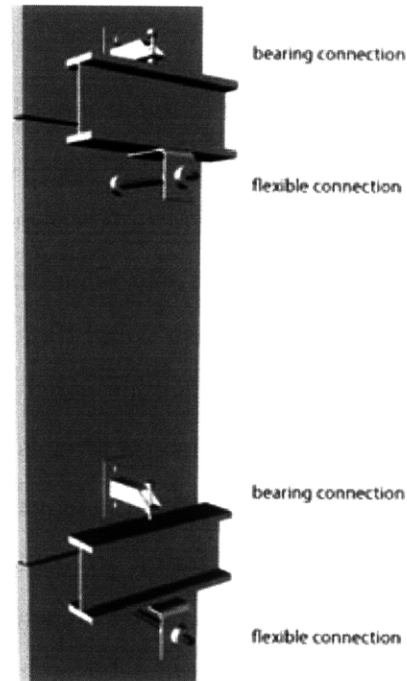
Typical lateral stayed connection that has bearing connection at the bottom and lateral connection on the top (Arnold, 2008)
